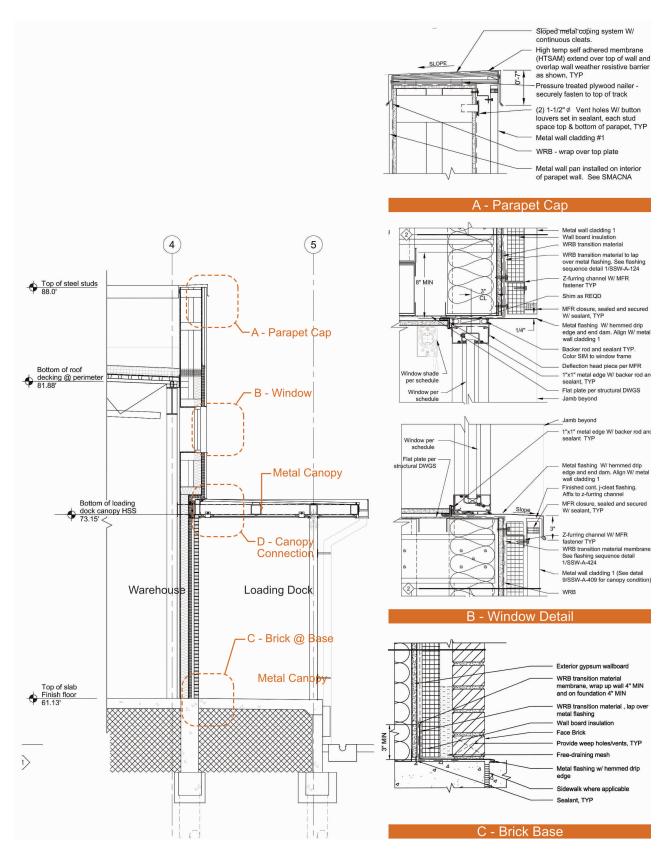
WAREHOUSE WALL SECTION AND DETAILS
